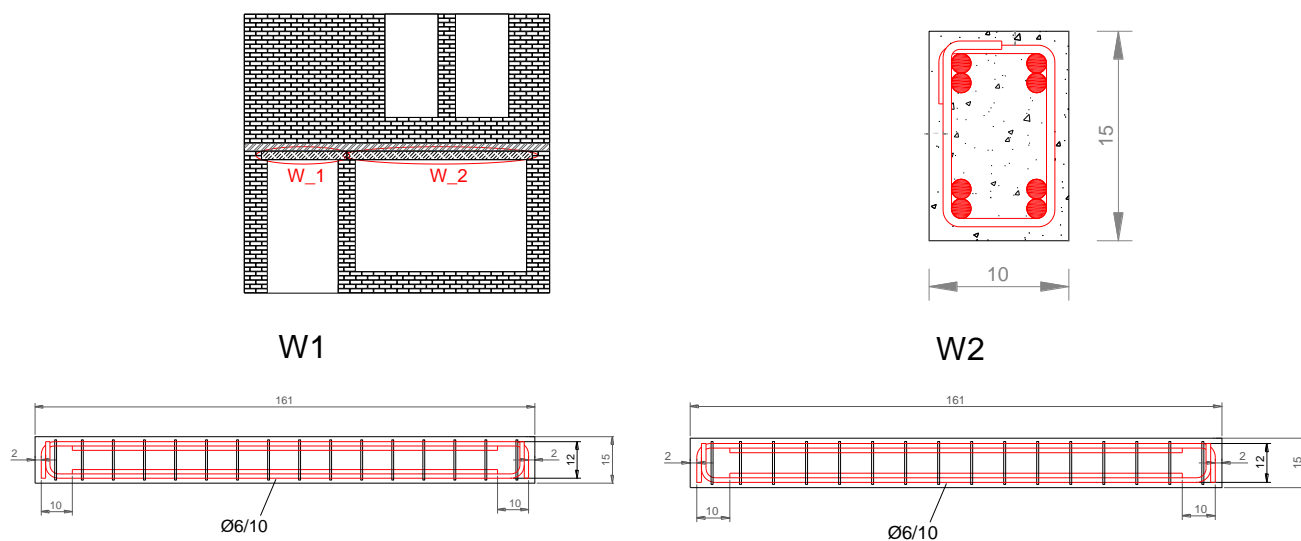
Reinforced concrete lintel details: West façade inner leaf. Units of cm.
